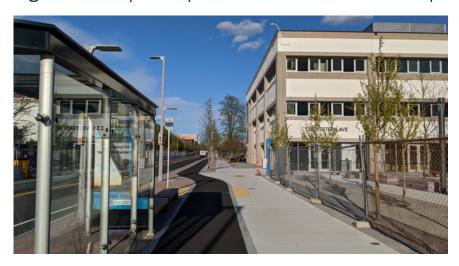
Example of a cross section with protected bike lanes with a curb separation
